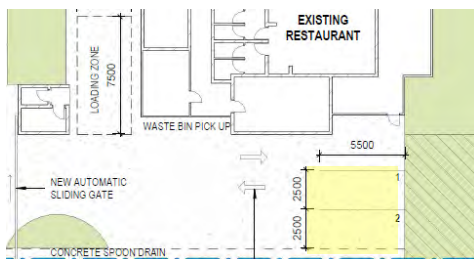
Proposed removal of Hartley Street access and reinstatement of 2 right angle parking spaces (highlight yellow), Proposed Site Plan, prepared by Funarchi, 25/03/2026
